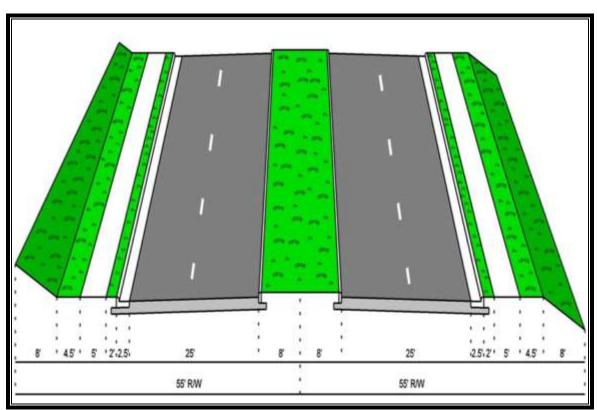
4-Lane, Divided (Raised Median), Curb and Gutter, Sidewalks Both Sides
